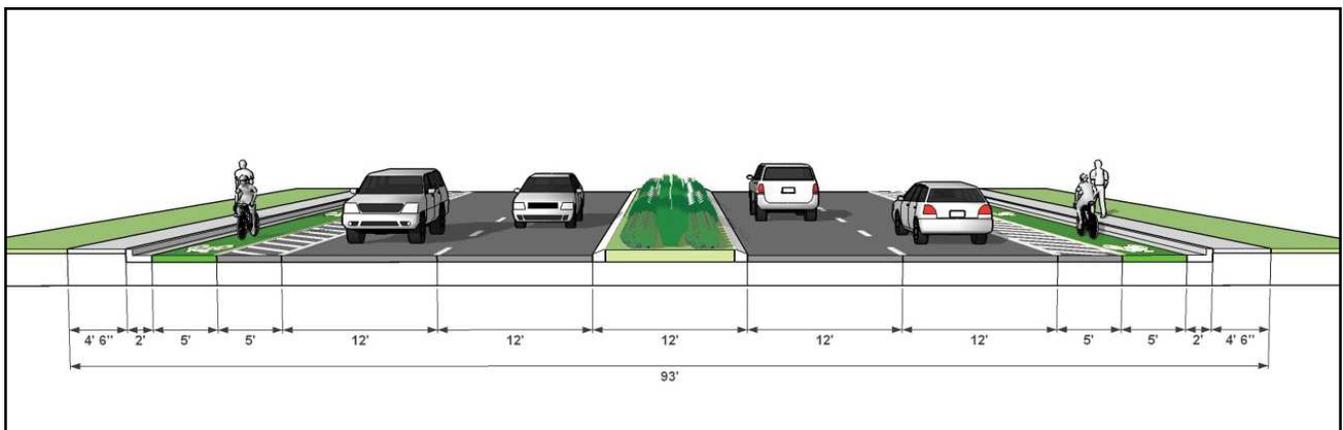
Southern Gateway Zone – Proposed Typical Section
